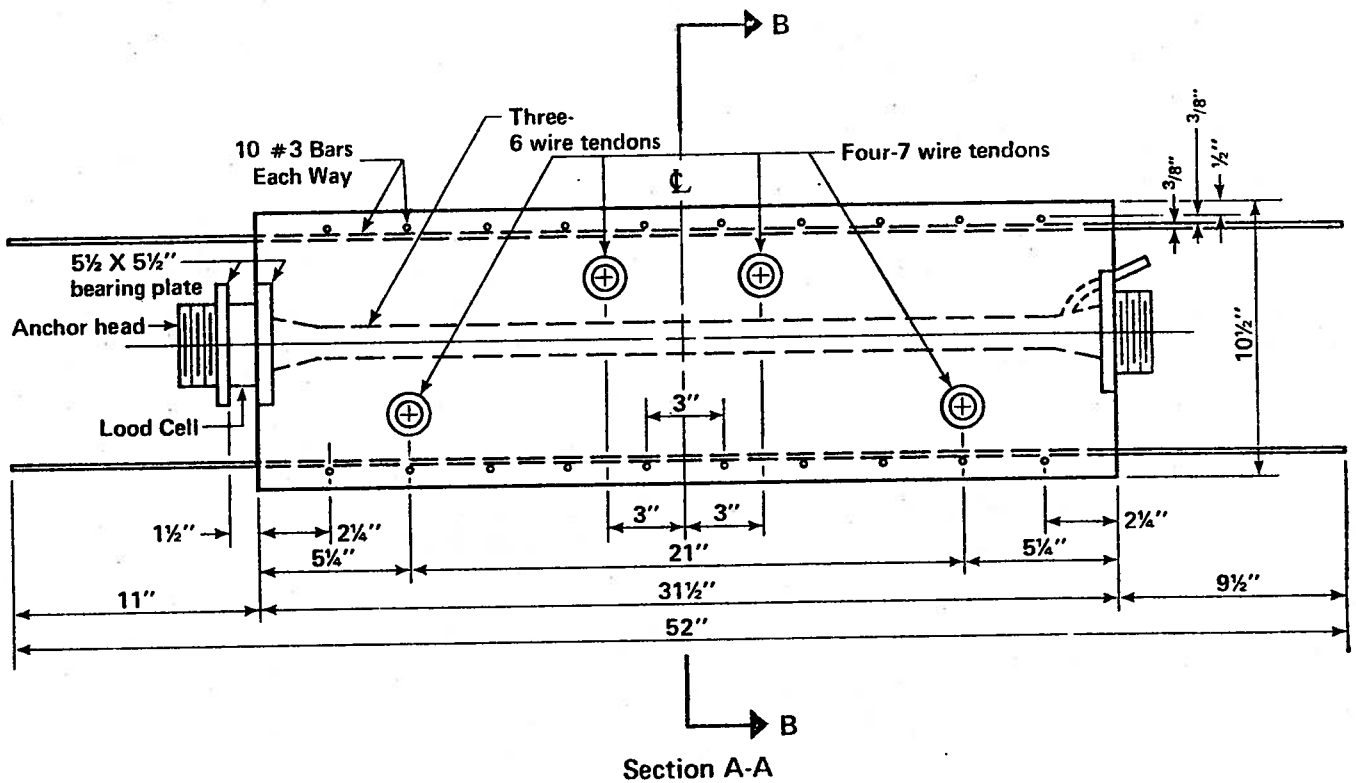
Typical Section A-A through Segment Test Specimens
